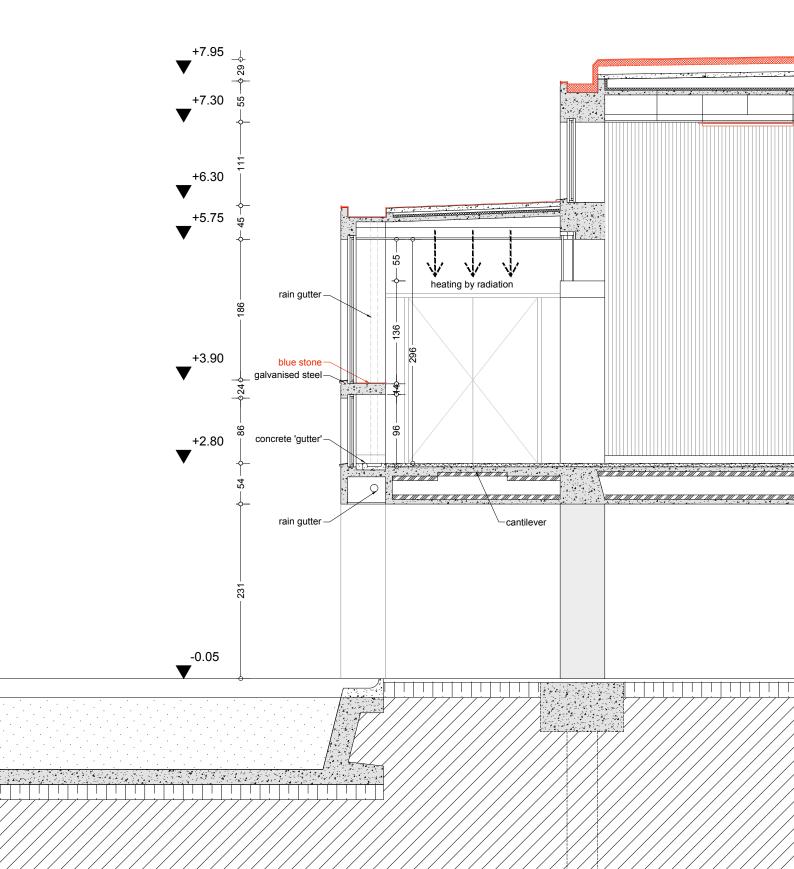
Indication section (adapted from Antwerp: deSingel).
